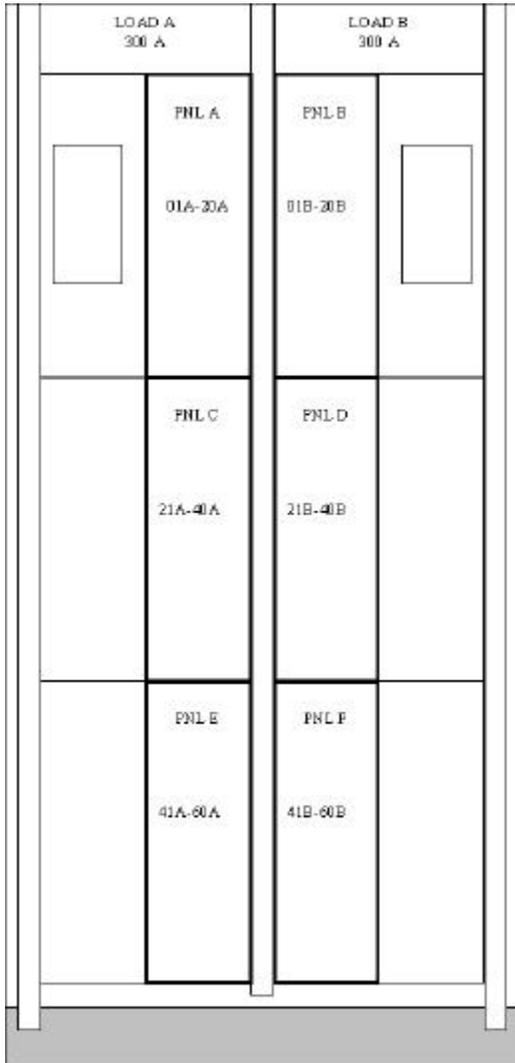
Typical Layout of 2 Load 600 Ampere BDFB
